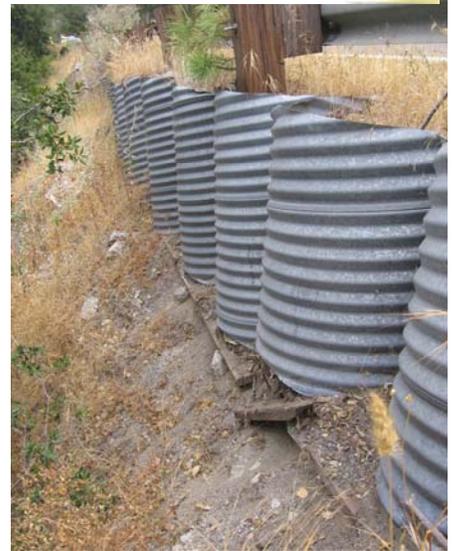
Rock exposure on toe slope below can-wall at Location 15; looking southerly; photo date 9-9-10.
